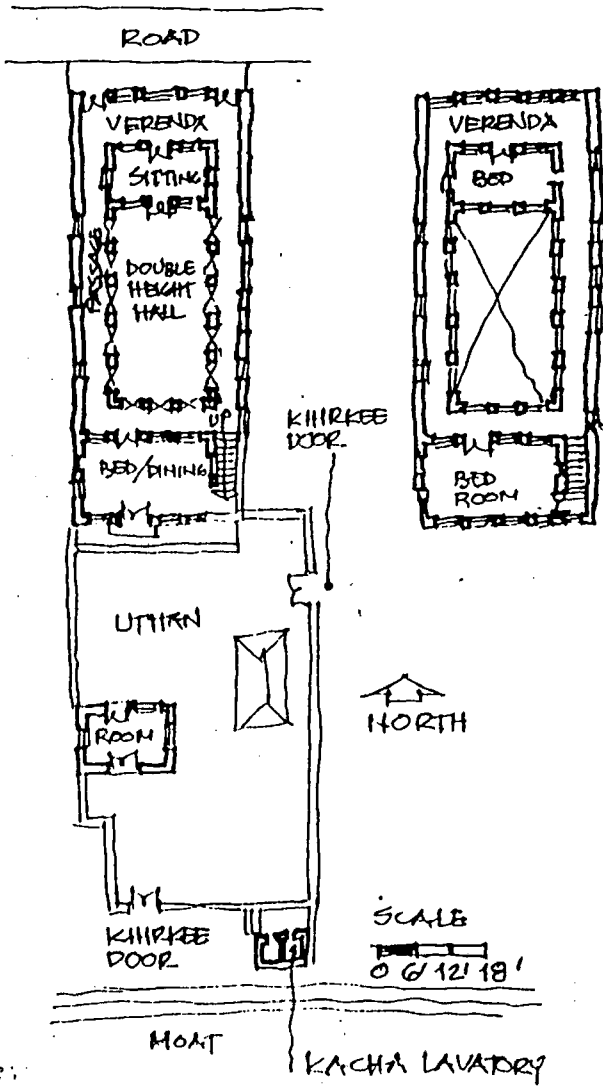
Ground floor plan, *Bagan bari*,
